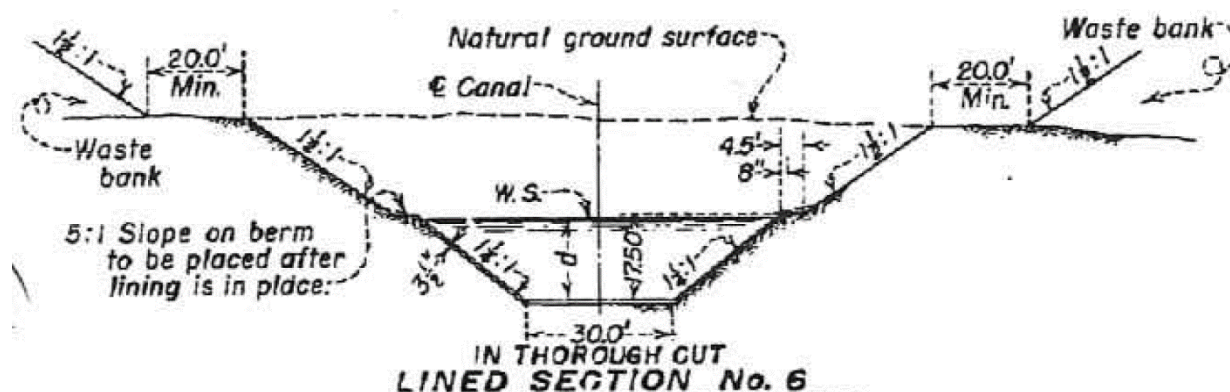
Typical Section, in Lined Thorough Cut Section
